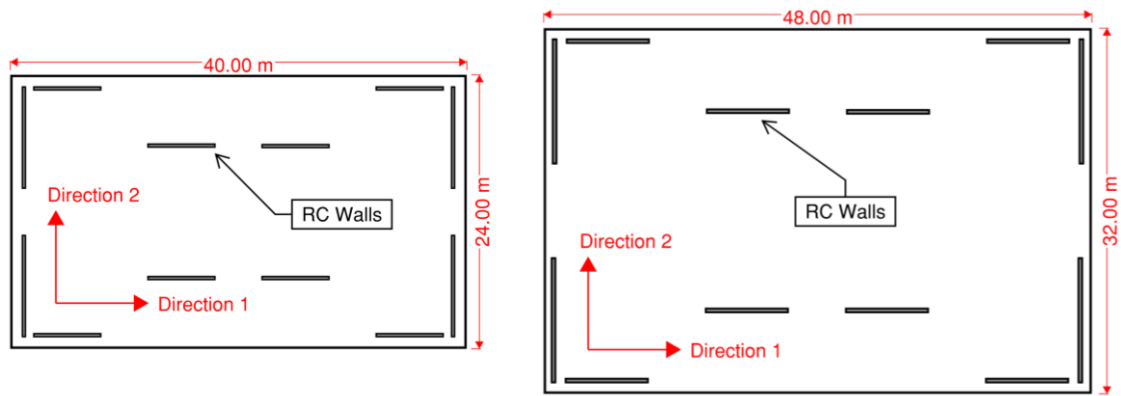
Plan view of case study RC wall buildings (left: 4-storey, right: 12-storey) (number of walls varies according to the design).
